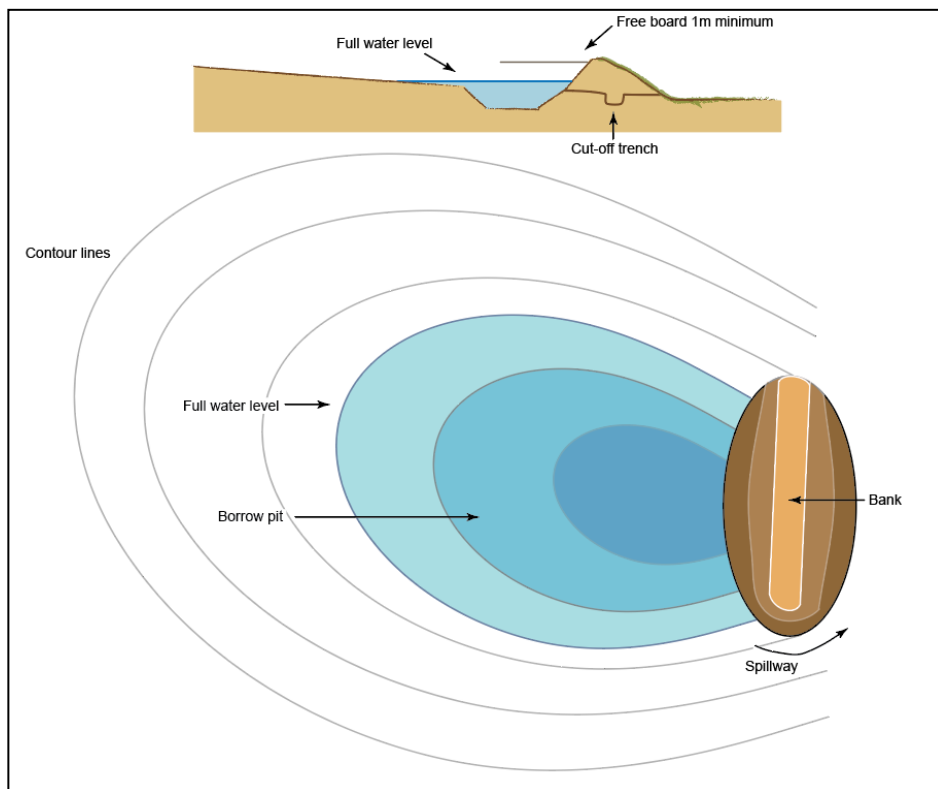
Typical configuration of a gully dam designed for multiple benefits. Note the cutoff trench underneath the dam wall.<sup>1</sup>
